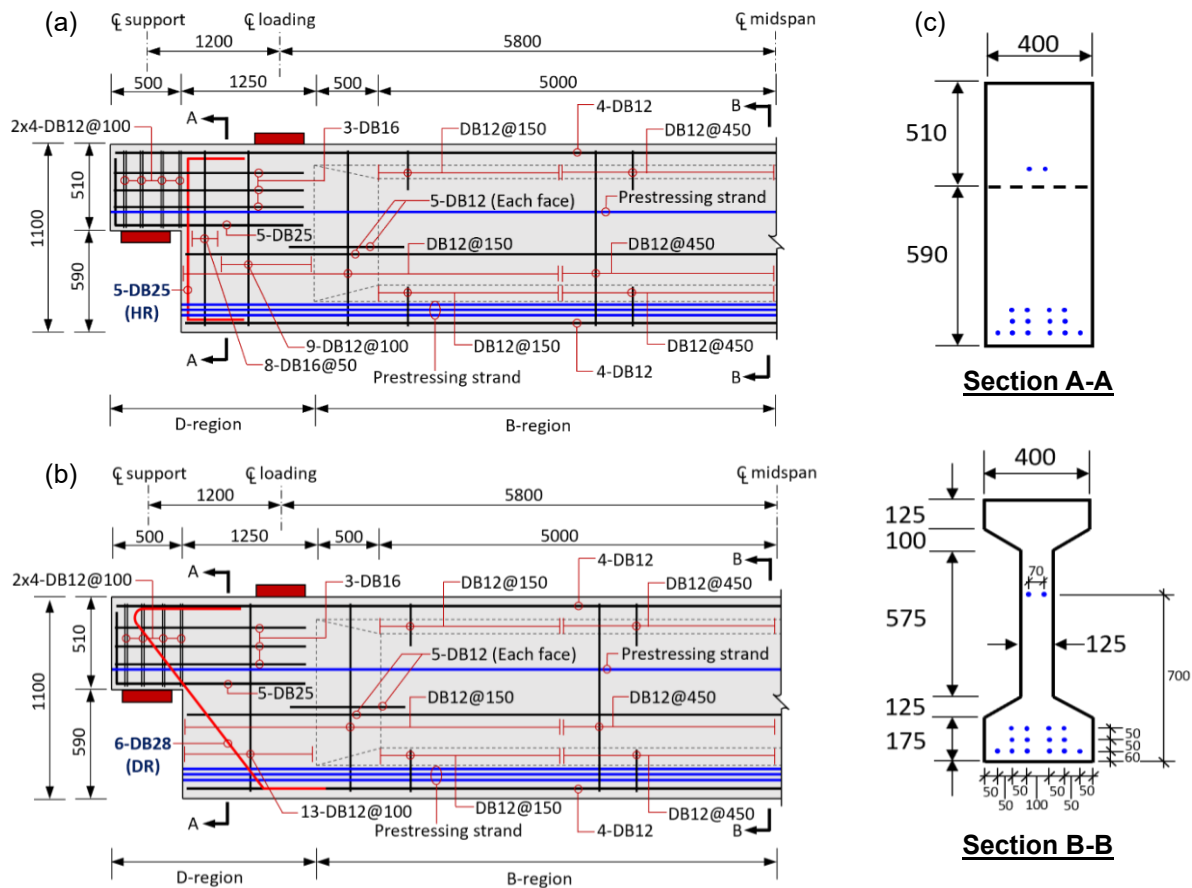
Reinforcement layouts and dimensions of DEBs; (a) Arrangements according to the original design, (b) Arrangements following the BS EN 1992, and (c) Cross-section detail (dimensions are in millimeters)
